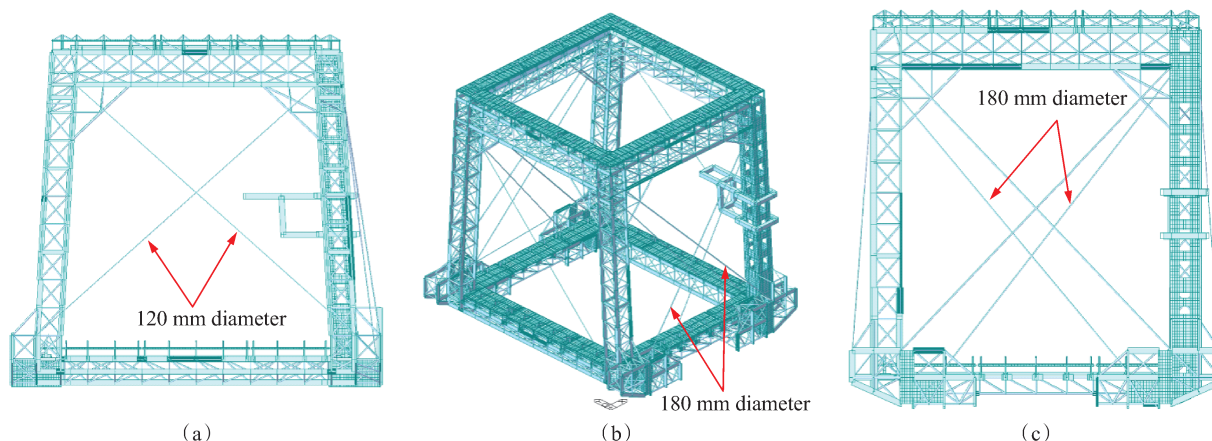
Recovery tower system and cable arrangement. (a) Two 120 mm-diameter cables on the ship length side; (b) Two 180 mm-diameter cables connected to the lower cross beam on the ship width side; (c) Two 180 mm-diameter cables connected to the support on the ship width side
